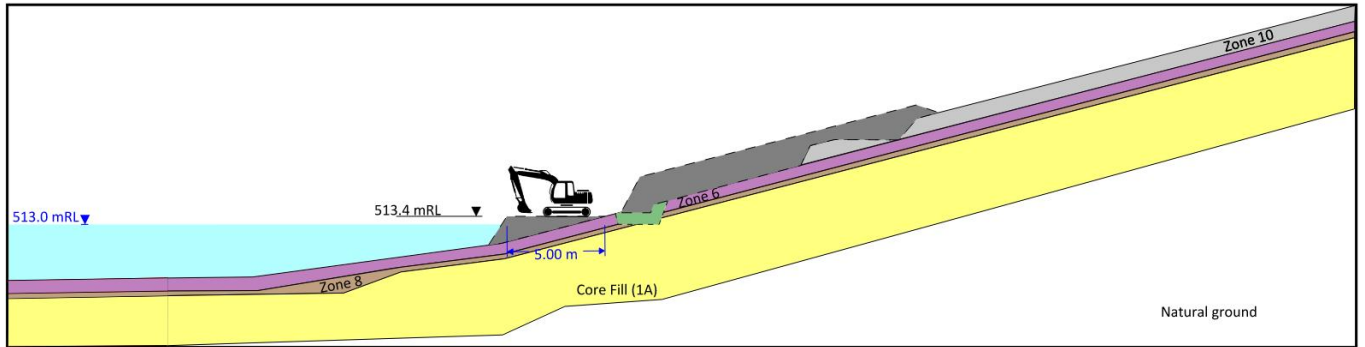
Schematic sketch – Tranche 2 – abutments – establishment of construction bench at 513.4 m RL
